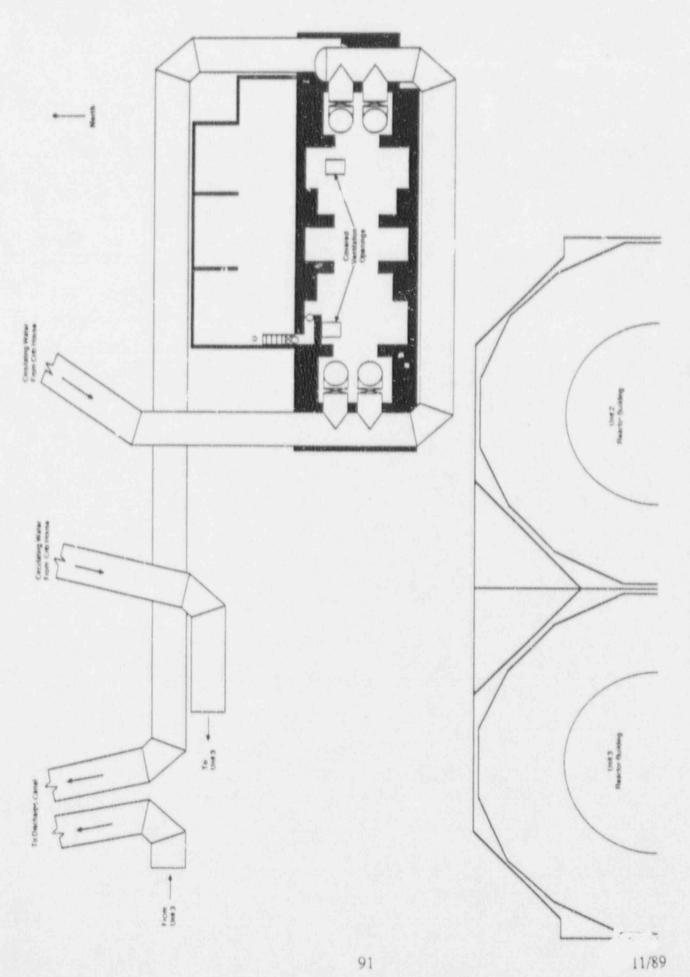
Dresden Unit 2 Turbine Building, Elevation 481'-0"
